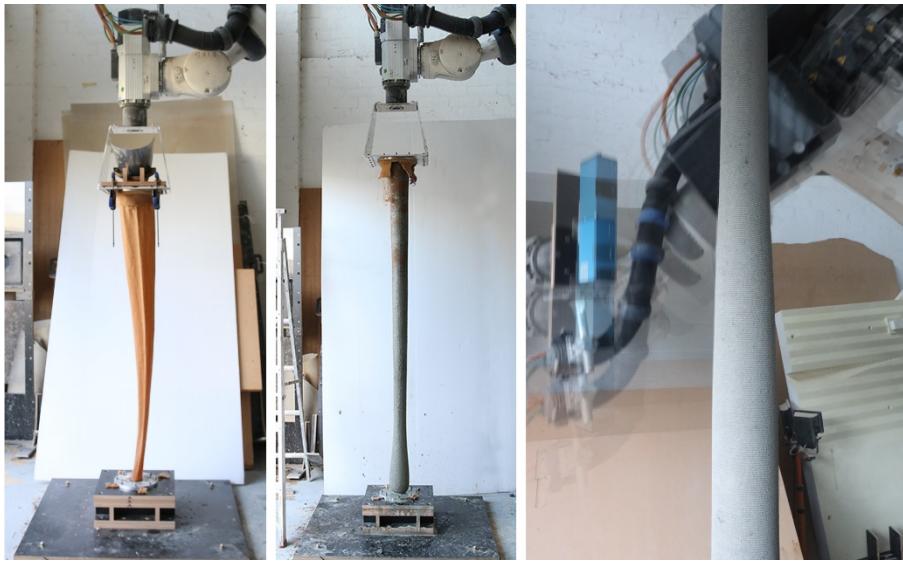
Right, fabric formwork clamp to the base of the fixture and hold up by the robotic arm.
